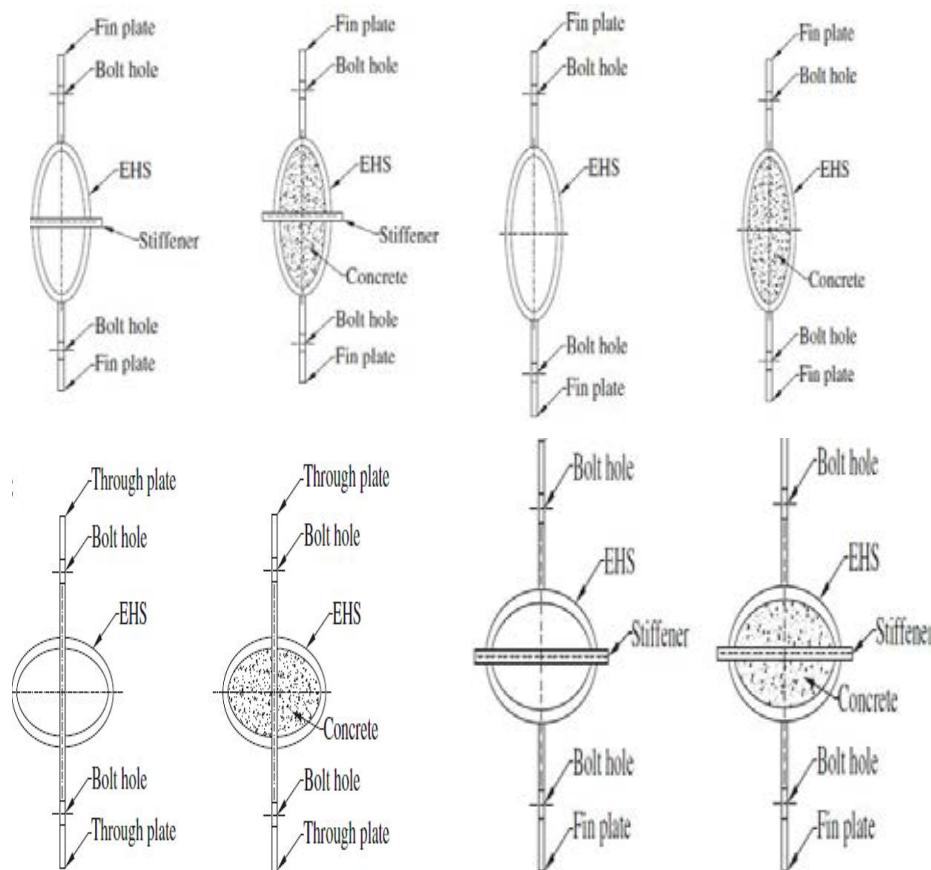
Beam-to-tubular column connections using stiffeners and internal plates (Yang et al., 2015).
